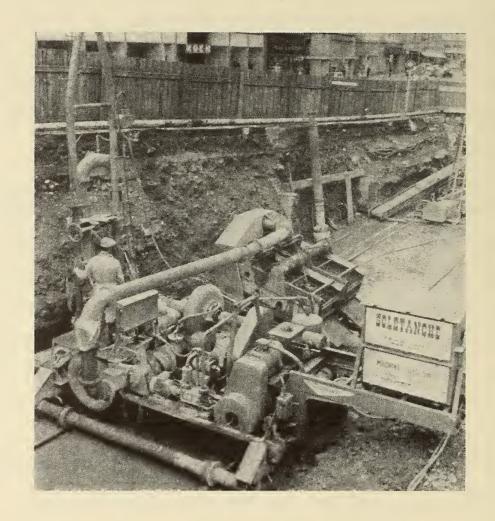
MONTREAL, CANADA, Slurry-Trench Excavation by the Soletanche method in shore-less excavation separates cuttings and recirculates bentonite slurry. (From Engi-neering News-Record, April 26, 1962, p. 100, by permission.)
